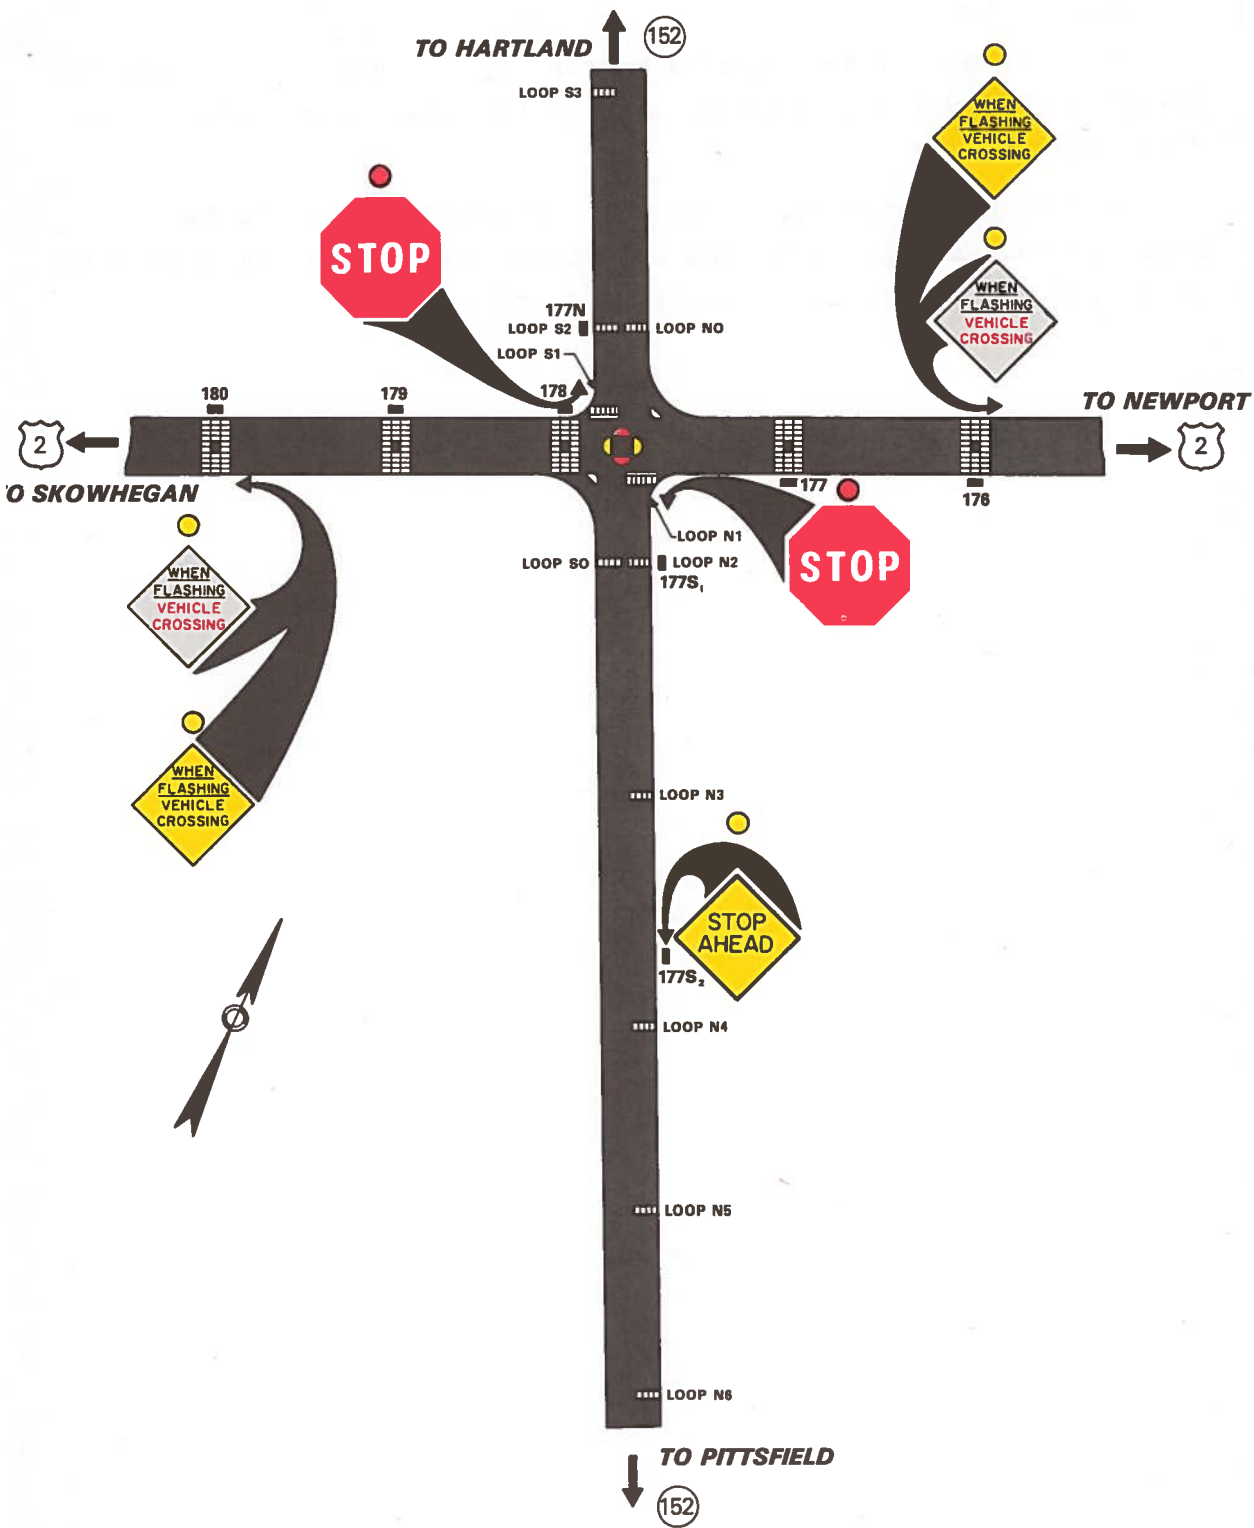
INTERSECTION SIGNS - SIGN CONDITION LAYOUT
